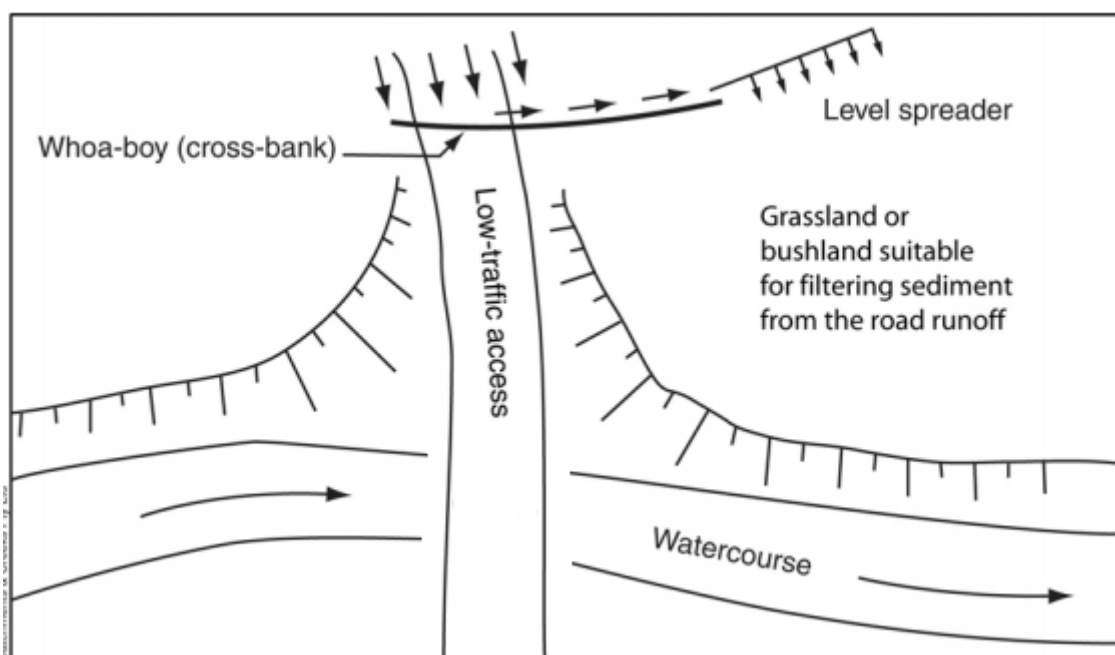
Construction technique for water crossing taken from IECA (2008)
